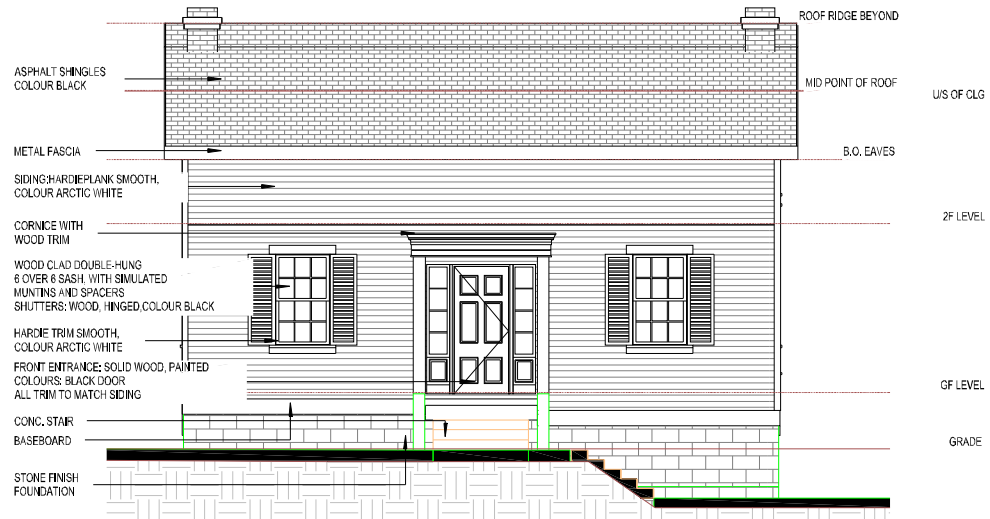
Proposed front (north) elevation for No. 89 Nashville Road.
